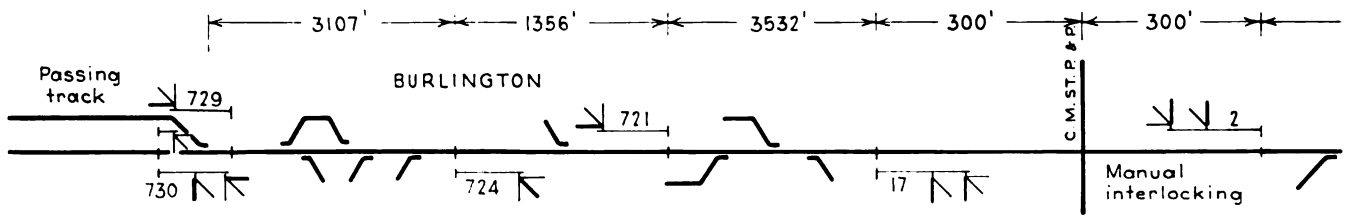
Track and signal plan of territory between Burlington, Wis., and
